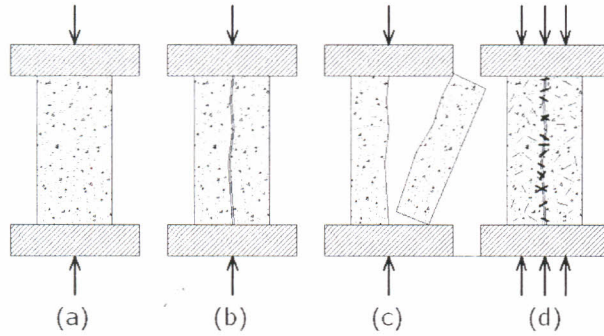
Mechanism under compressive load (a) uniaxial loading, (b) crack initiation, (c) spalling of plain concrete and (d) crack bridging by steel fibers in SFRC.
